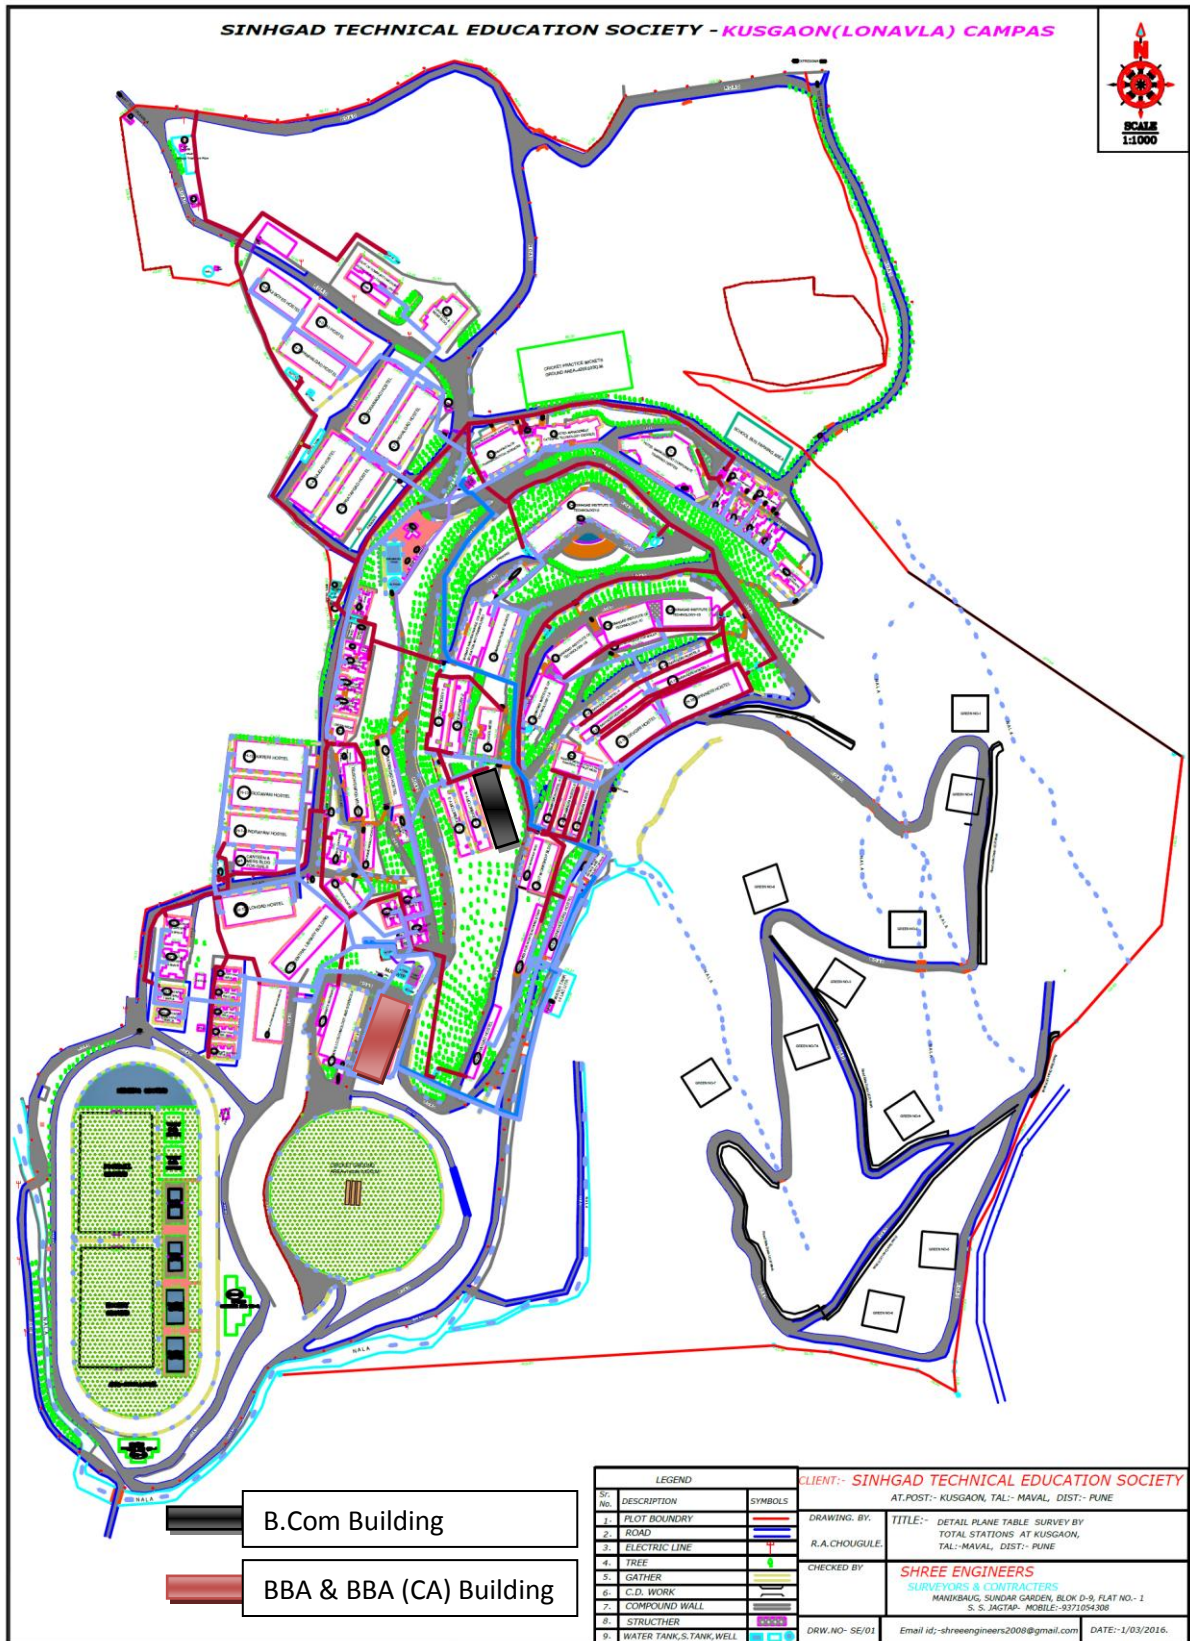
Master Plan of Sinhgad Institute, Lonavala
